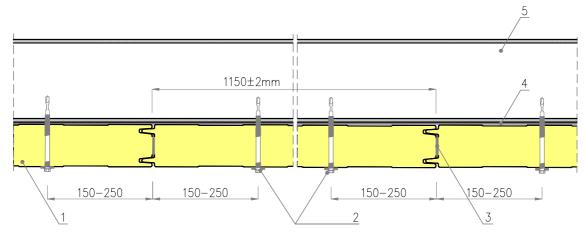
IzoWall PIR/PIR+; MWF; EPS - vertical layout, fastening to the structure
